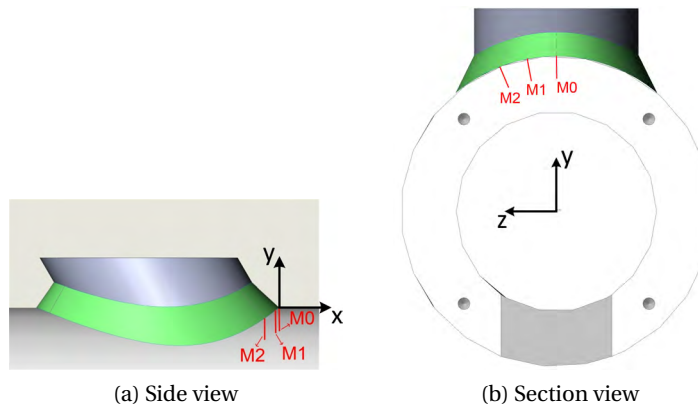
Measurement locations on the chord's weld toe (Specimen S7-355).
